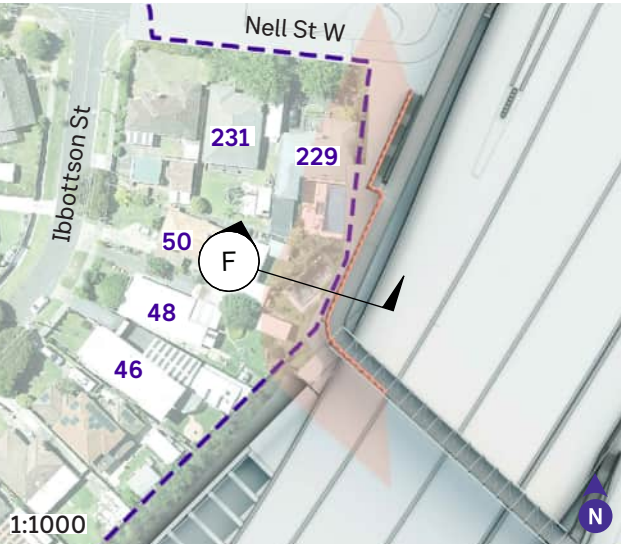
Focus Analysis: Nell Street Shared Use Path Bridge - Western Ramp Overlooking Analysis Plan - throw screen Type A or B application (no overlooking mitigation)
